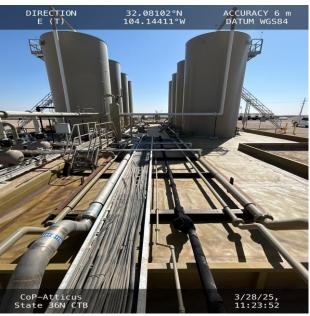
View of central portion of secondary containment Photo 12 towards east.
